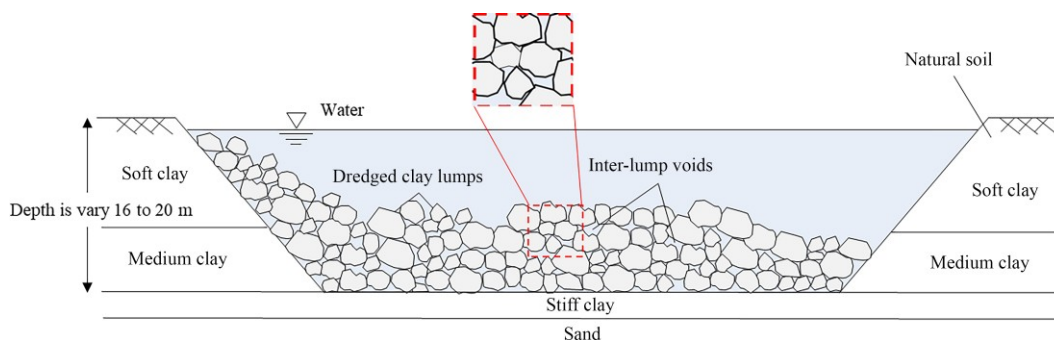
Schematic profile of reclaimed large excavation pit filled with soft clay lumps
